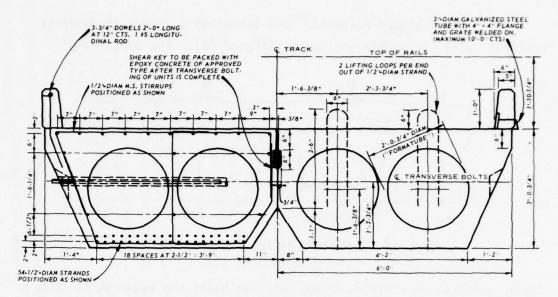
Design of the typical precast concrete box girder section (from Reference 33)
